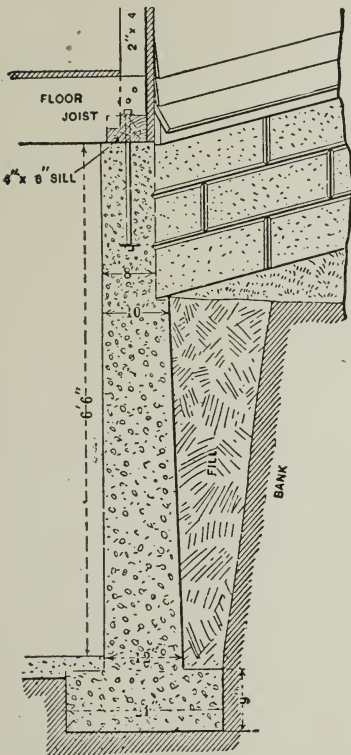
Typical Concrete Cellar Wall and Footing for Frame Building.
